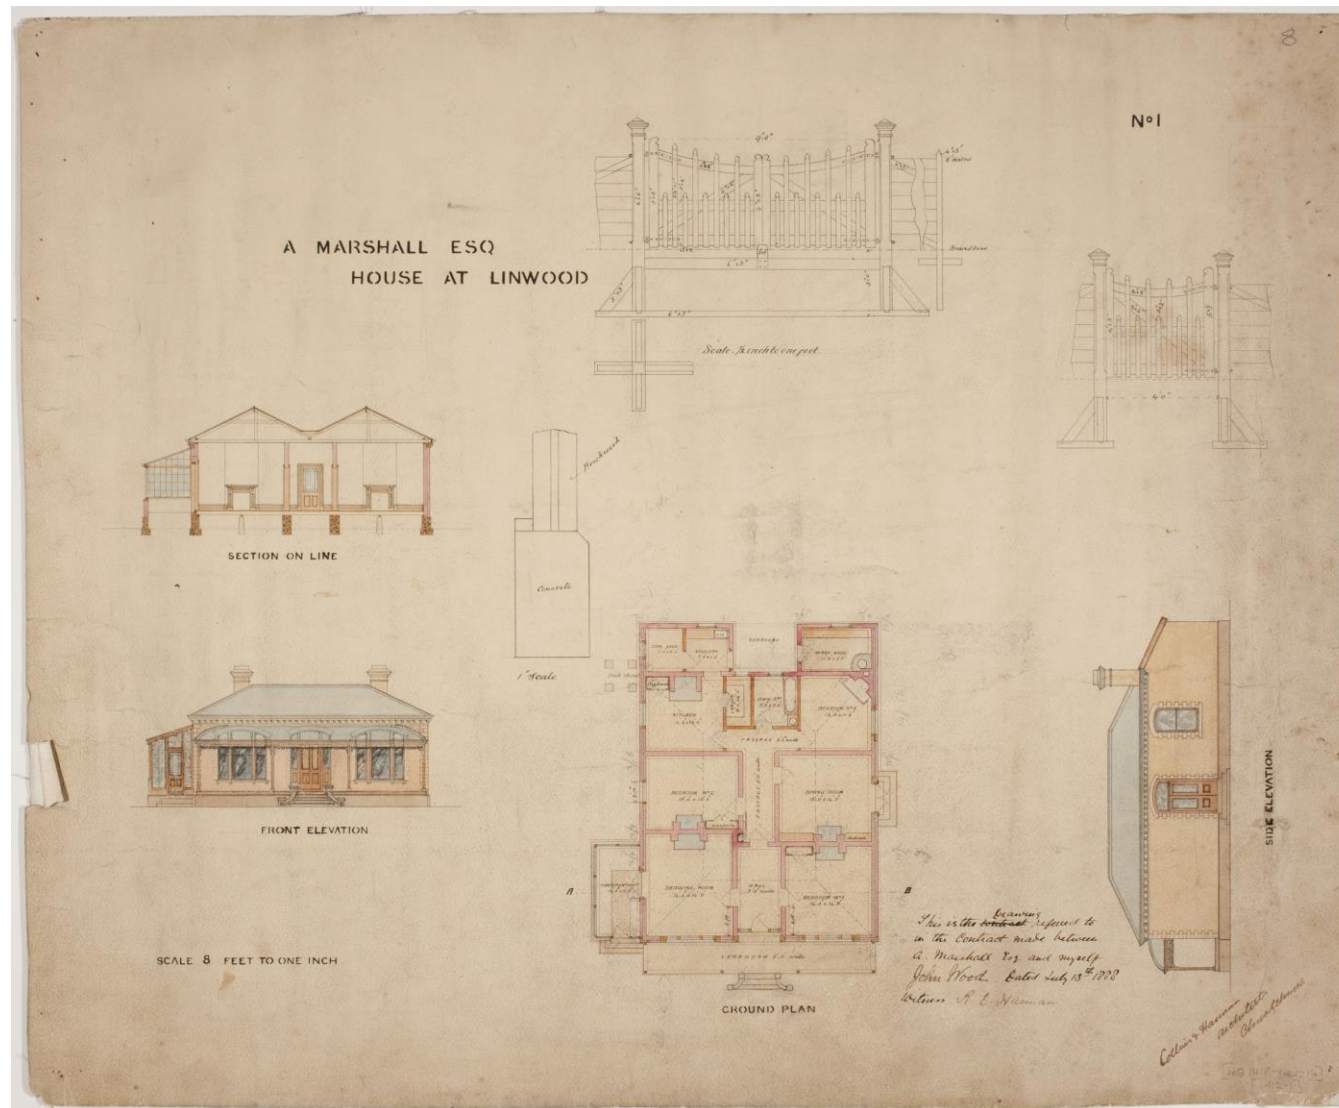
Collins and Harman, A. Marshall, Esq., House at Linwood, plan, elevations, section and details (1888).
